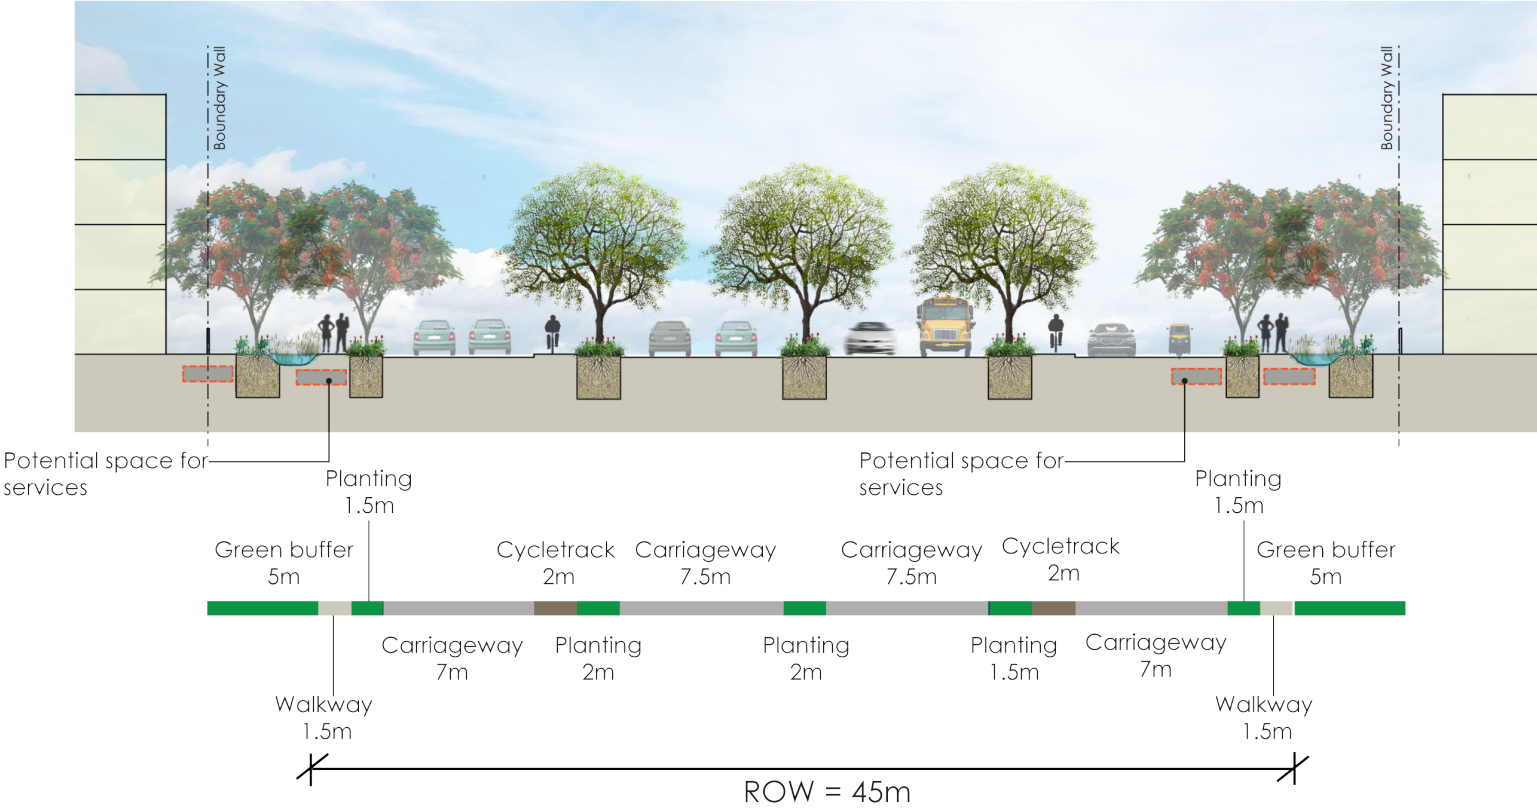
Proposed Typical Section 45 mts. ROW Road
